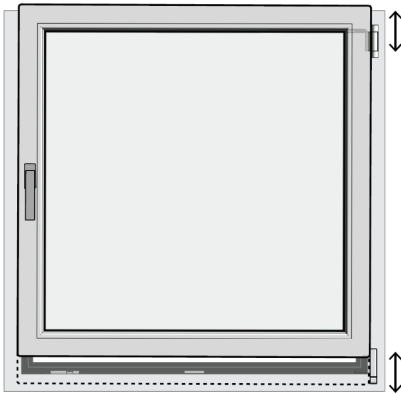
Bottom Hinge Up/Down adjustment, Sash movement shown is exaggerated for clarity.
